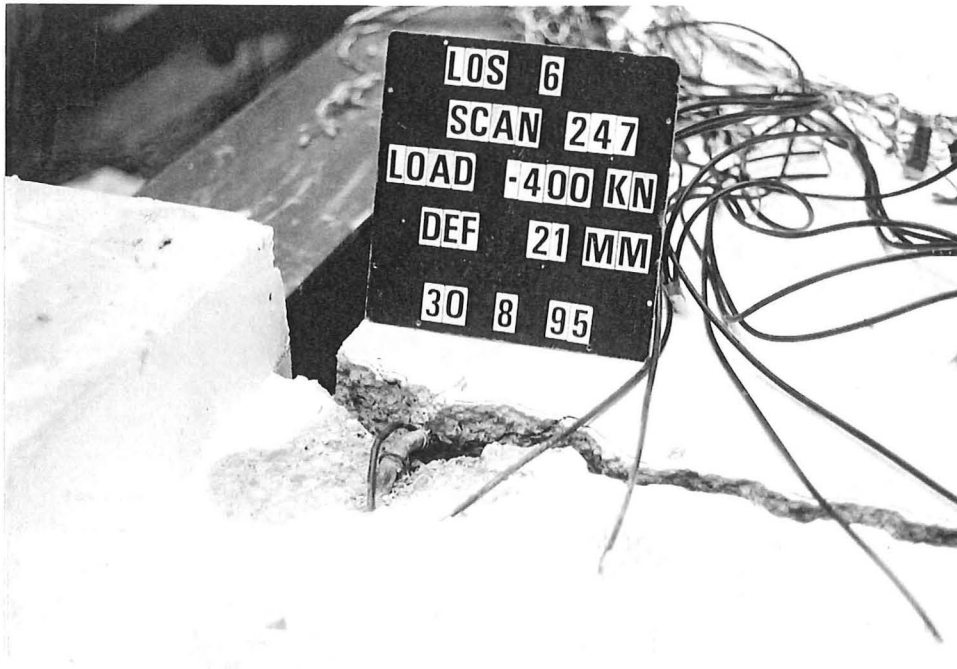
Spalled topping slab concrete caused by buckling of Detail A
